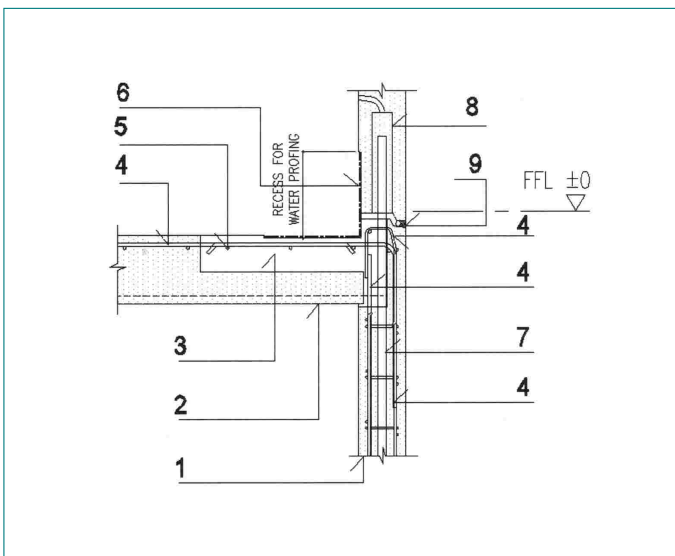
Different splicing details for connection between the upper and lower precast wall units
